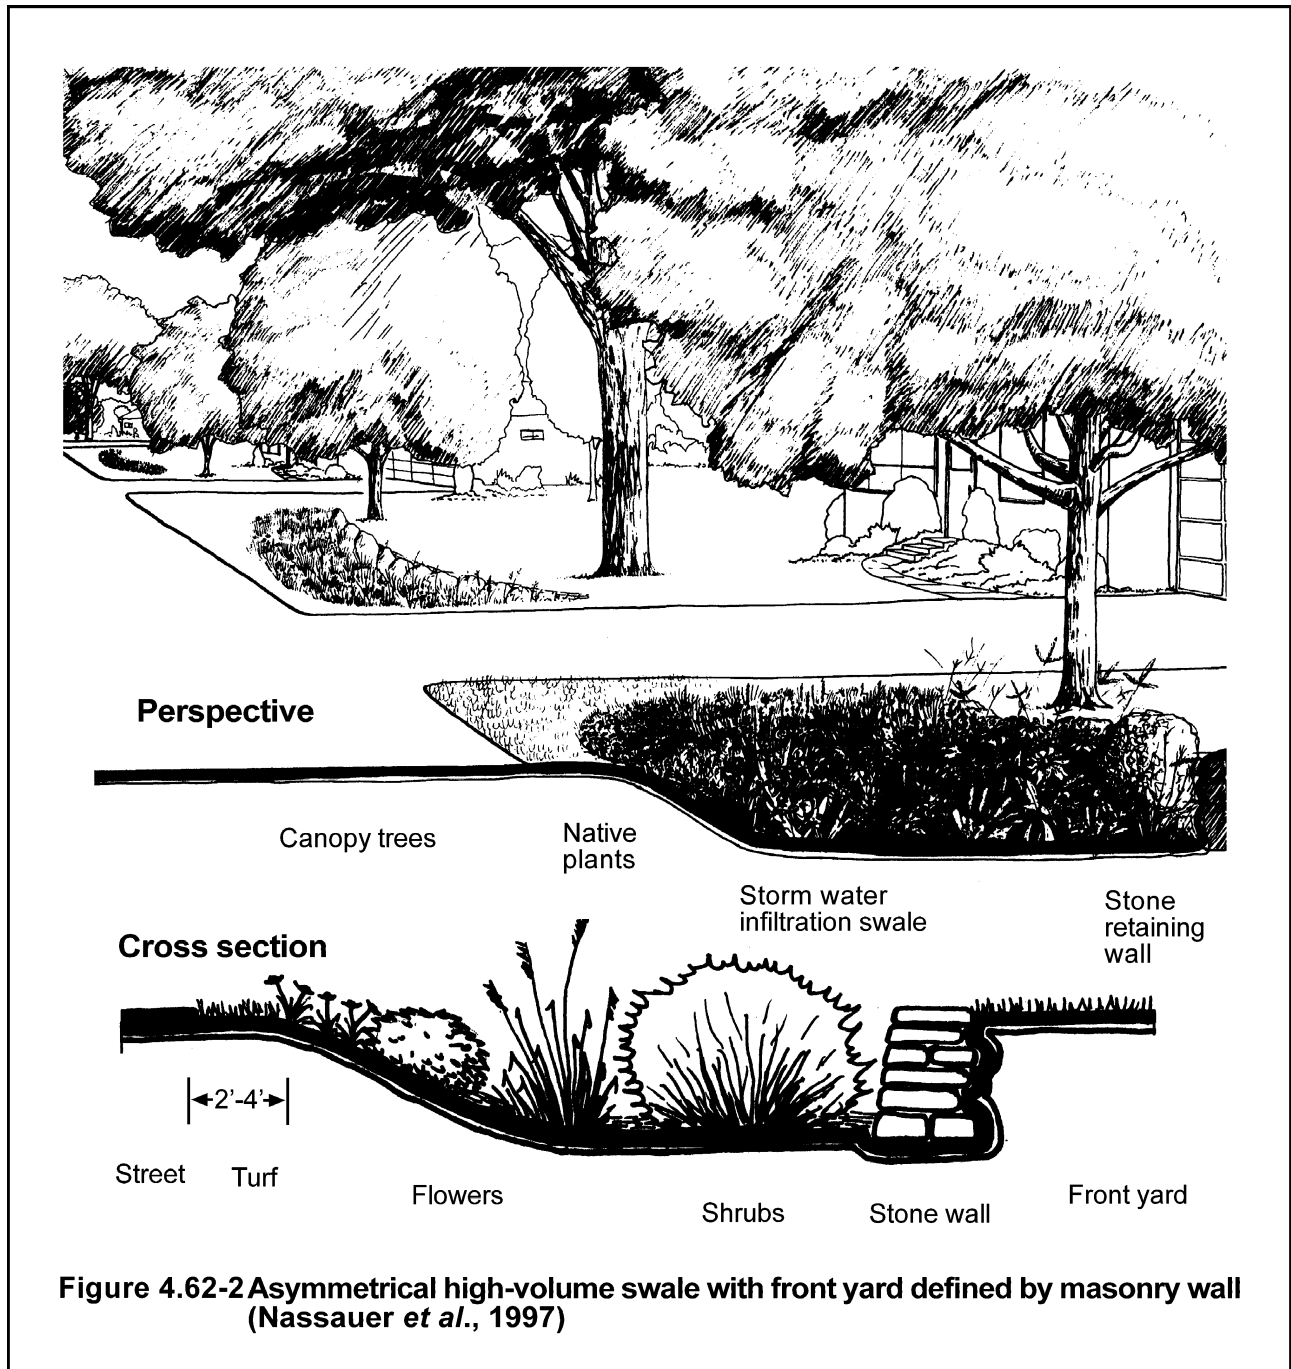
Asymmetrical high-volume swale with front yard defined by masonry wall (Nassauer et al., 1997)
